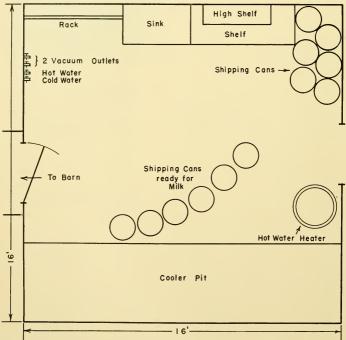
Floor plan of a milk house, illustrating one arrangement of shipping cans before milking begins.
